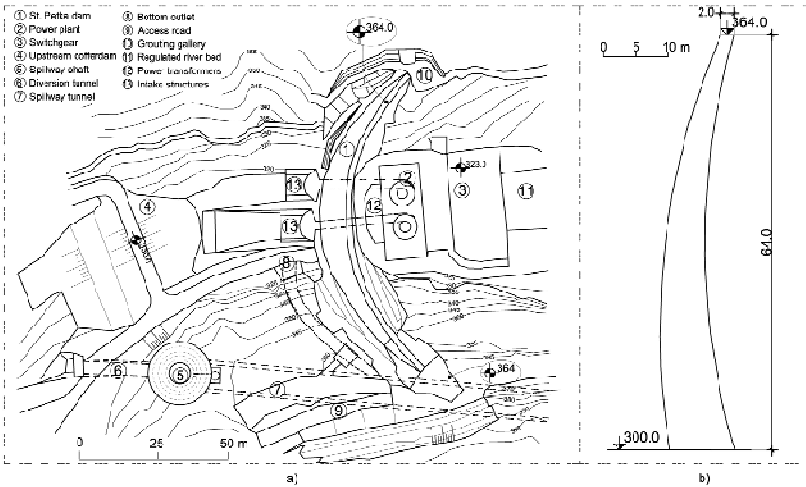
St. Petka dam. a) Dam layout, b) Central cross-section.
